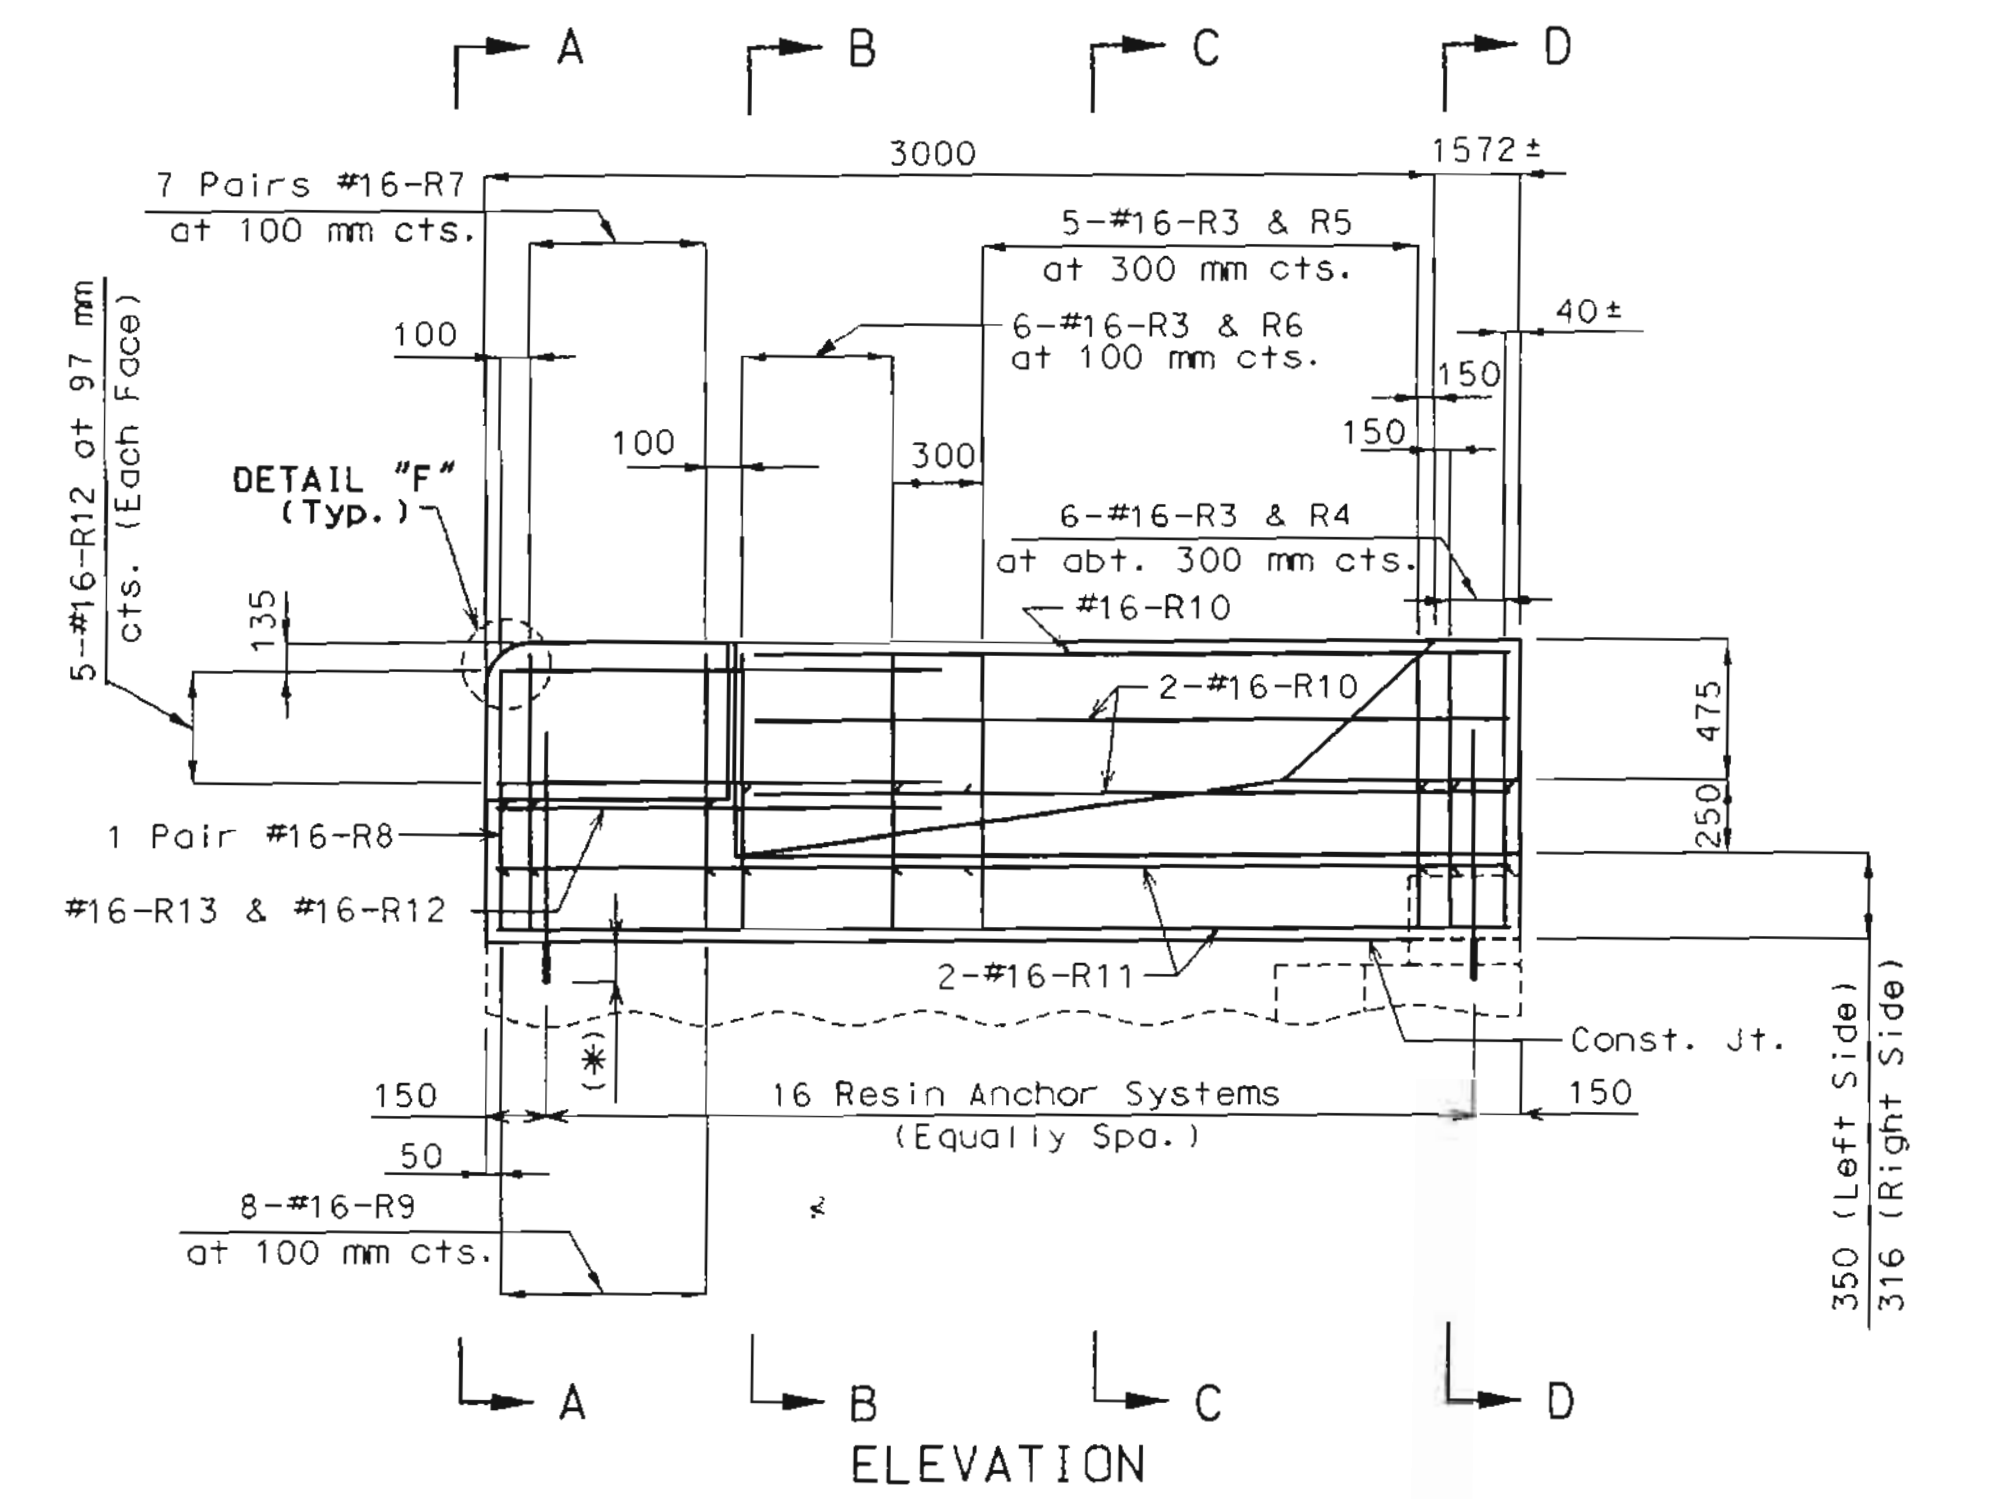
DETAIL SHOWING LOCATION OF RESIN ANCHOR SYSTEMS
